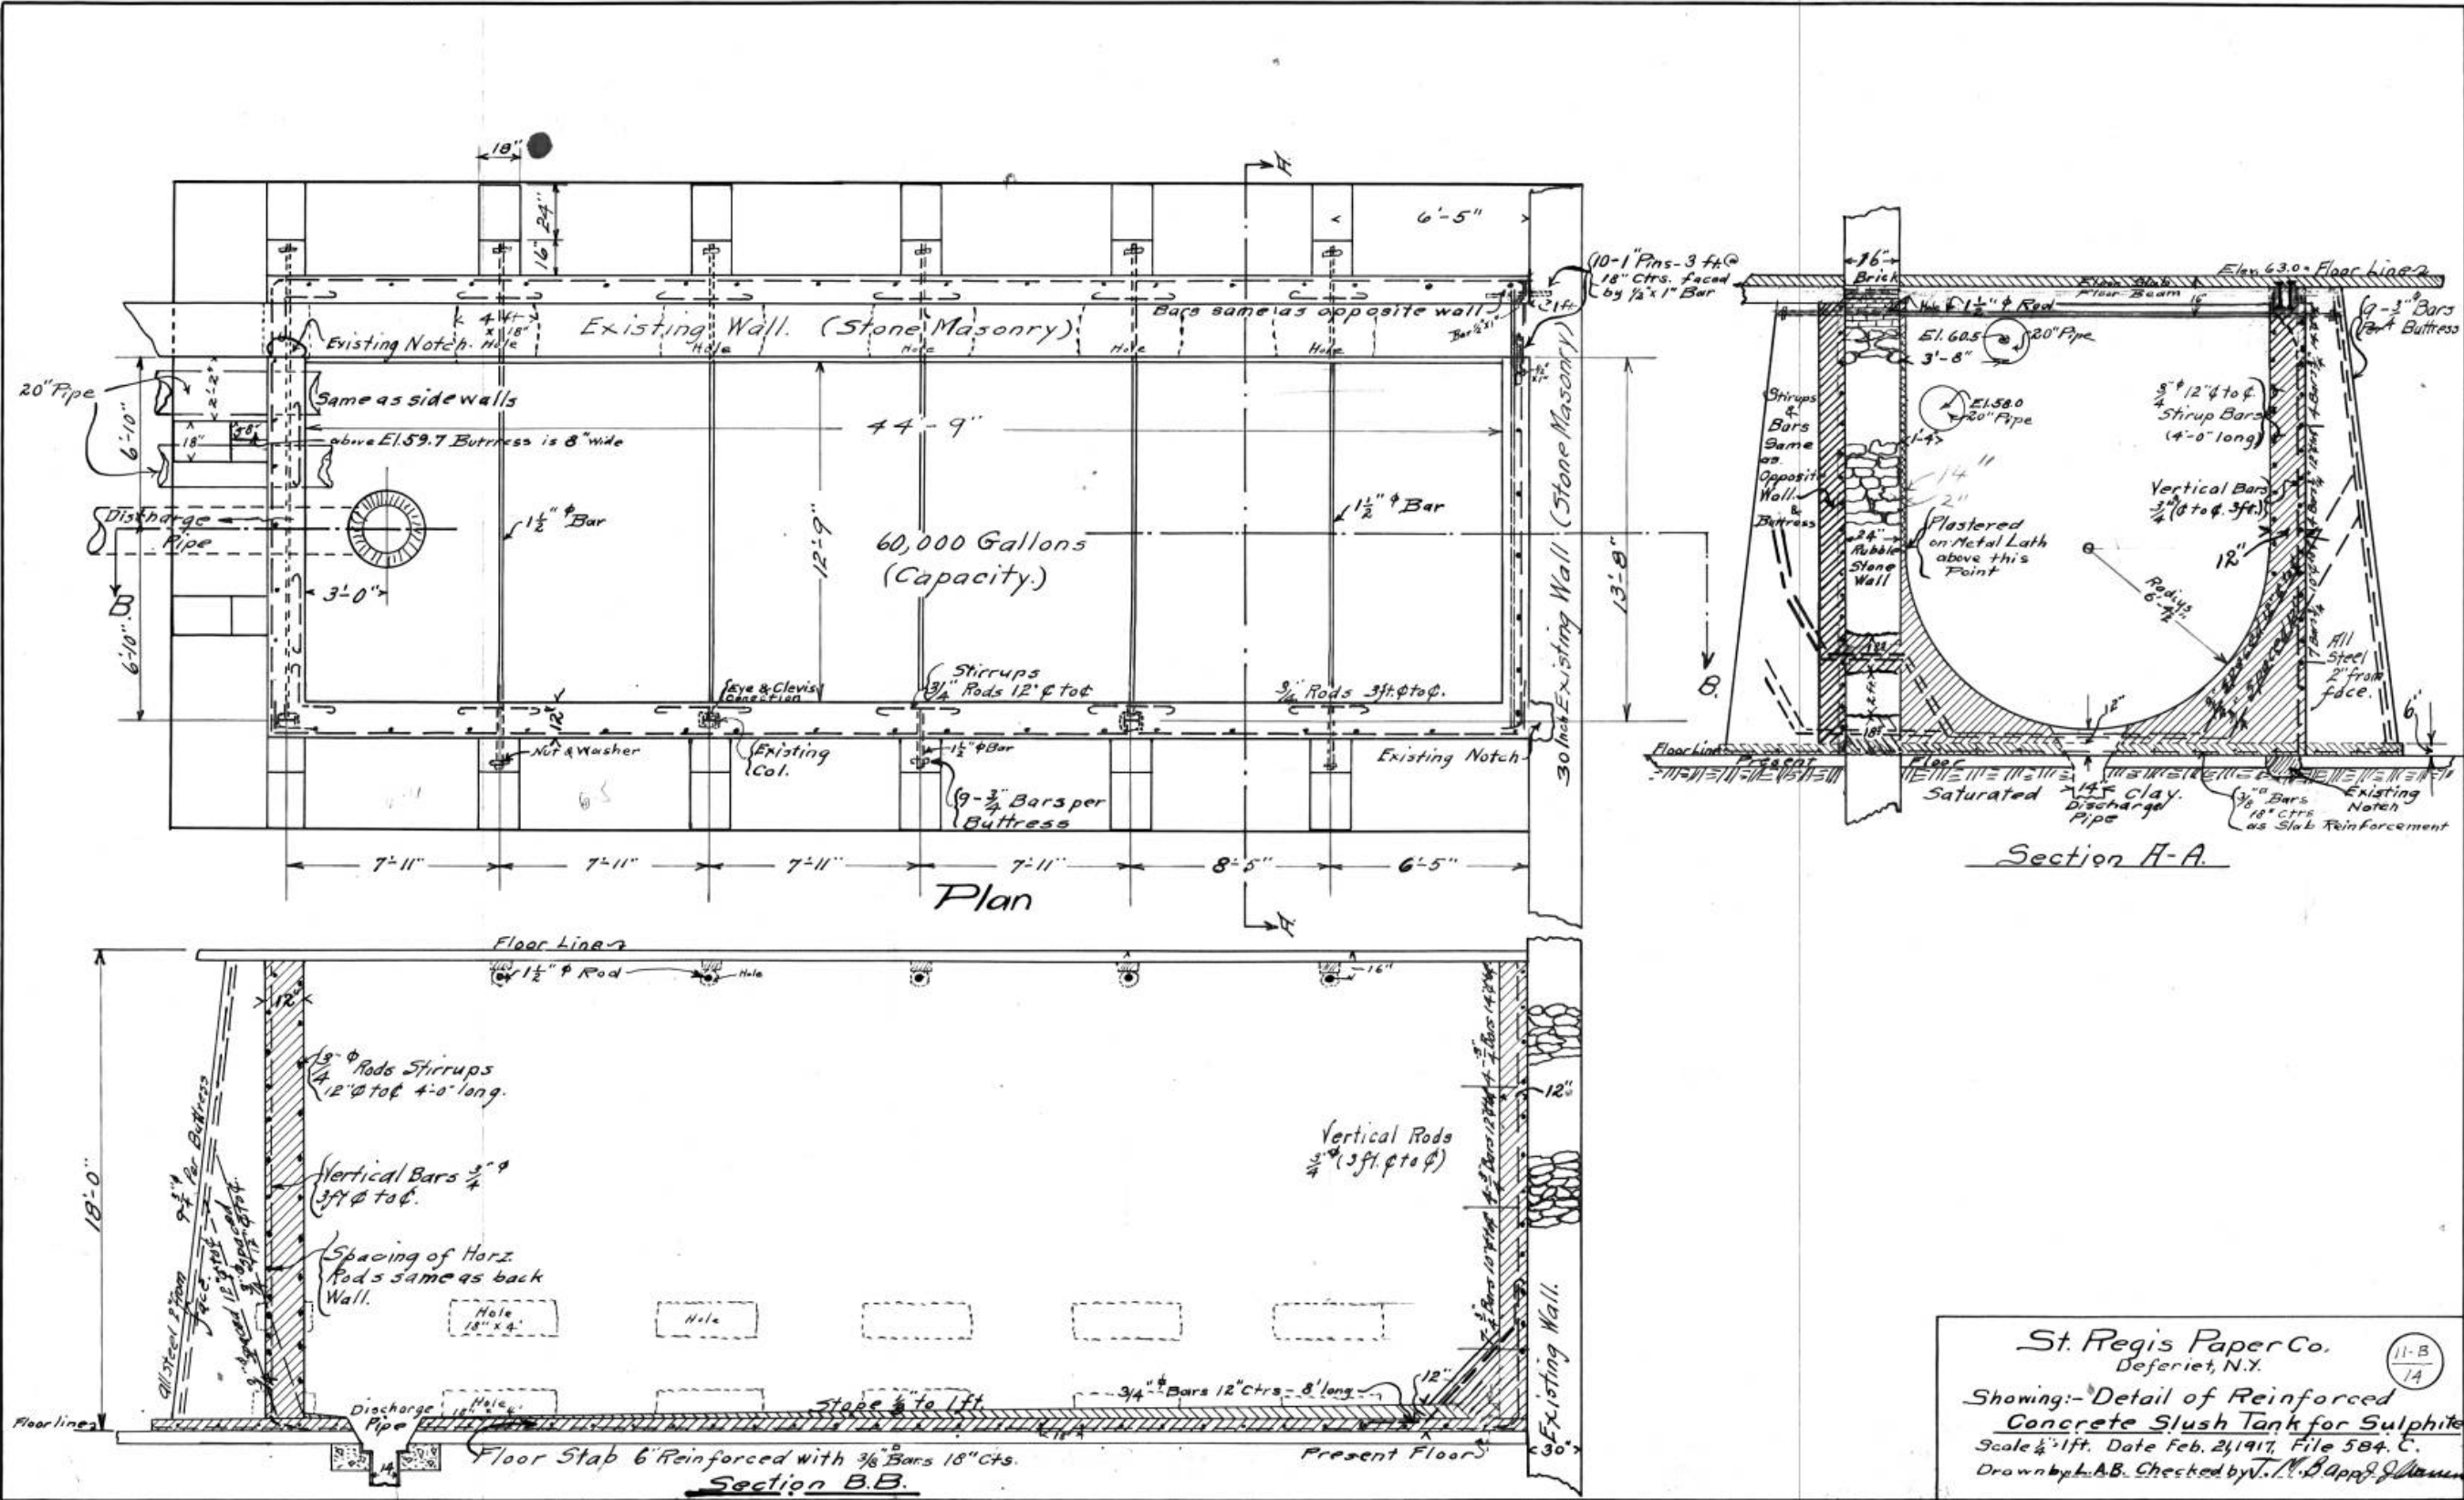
Plan and sections of the slush tank for the sulfite mill (undated).
